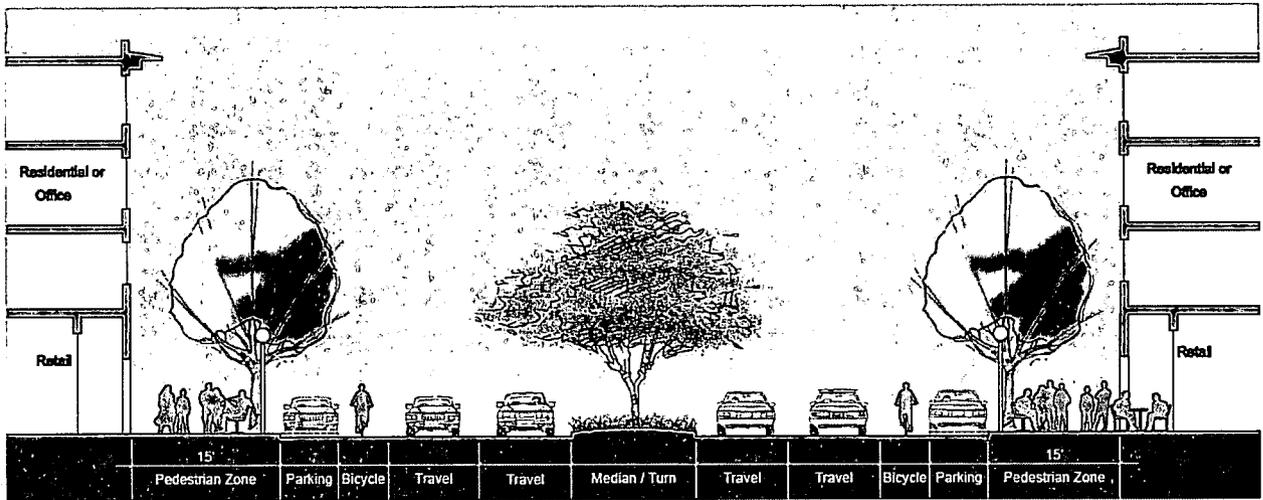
65<sup>th</sup> Street between Elvas Avenue and Folsom Boulevard
